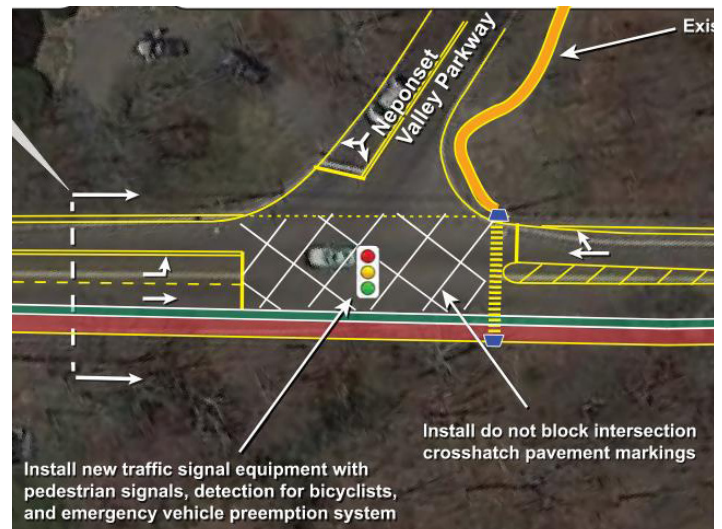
MassDOT Proposed Intersection at Neponset Valley Parkway and Route 138 / Blue Hill Avenue (Alternative 1)
